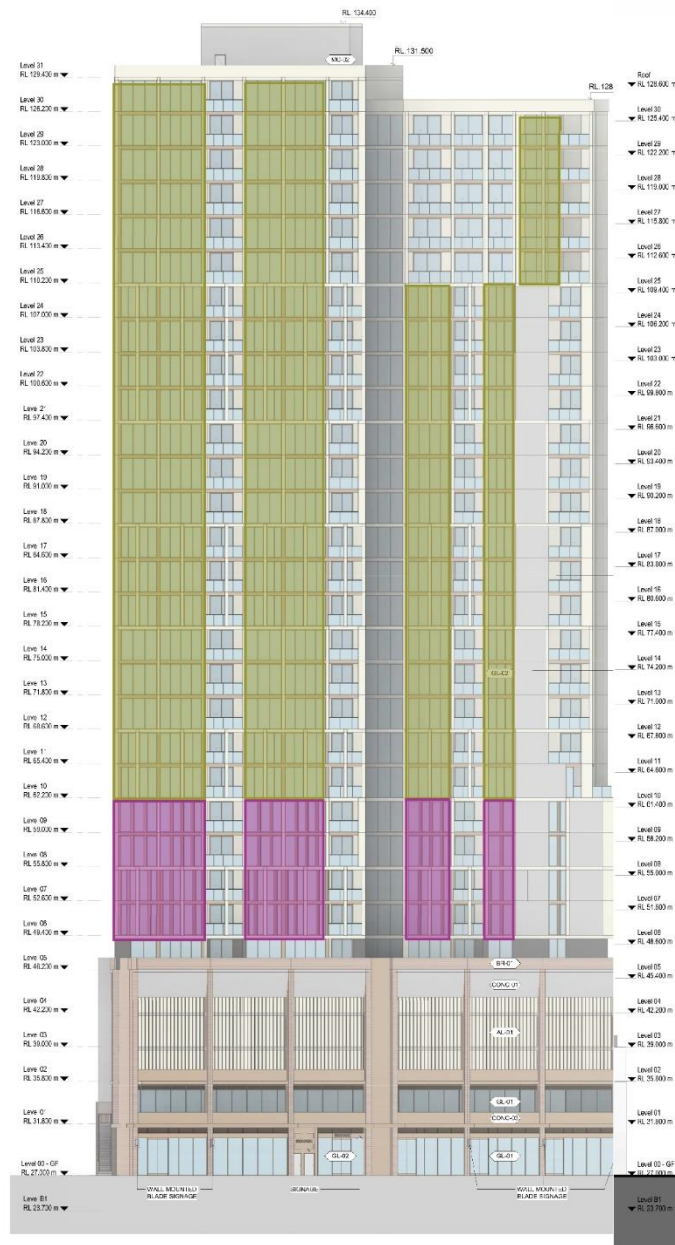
Suggested Treatments – Tower A, Eastern Elevation (for external façade)
